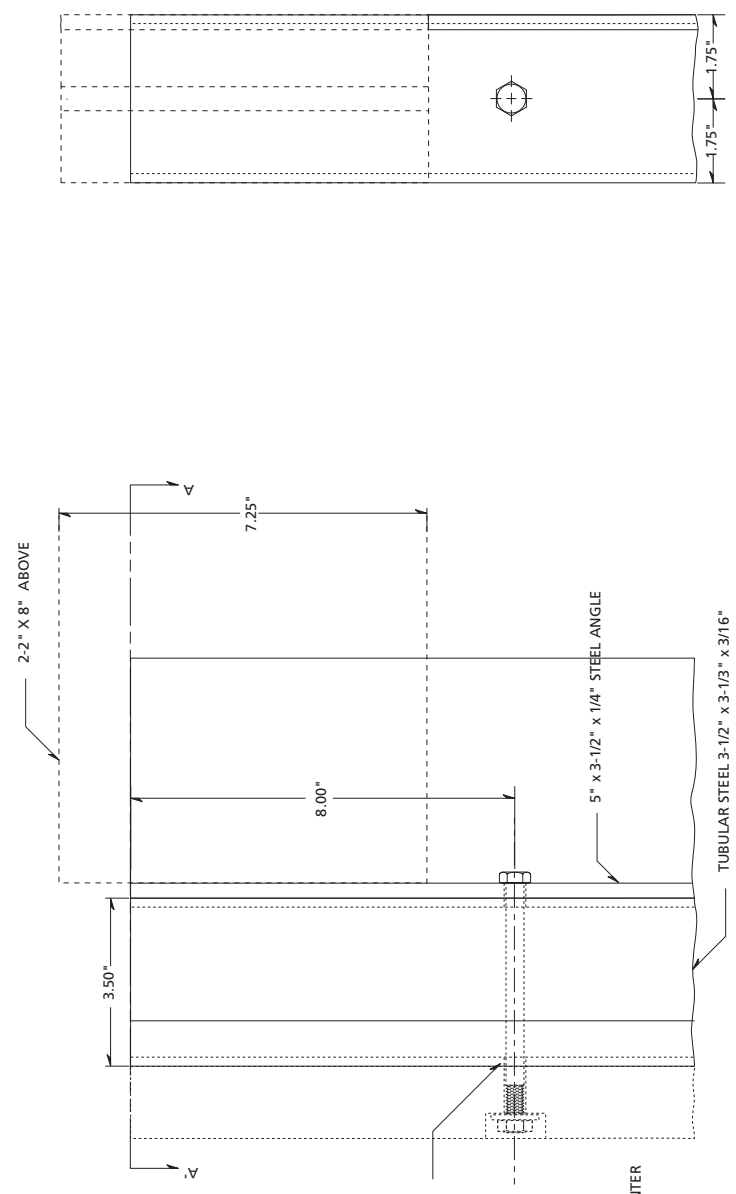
DETAIL POST ASSEMBLY 3-1/2" x 3-1/2" x 3-1/2" x 3/16" FRONT ELEVATION
